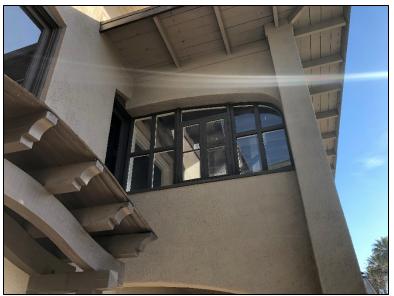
View of second-floor window at front of subject property, looking east from front porch.
